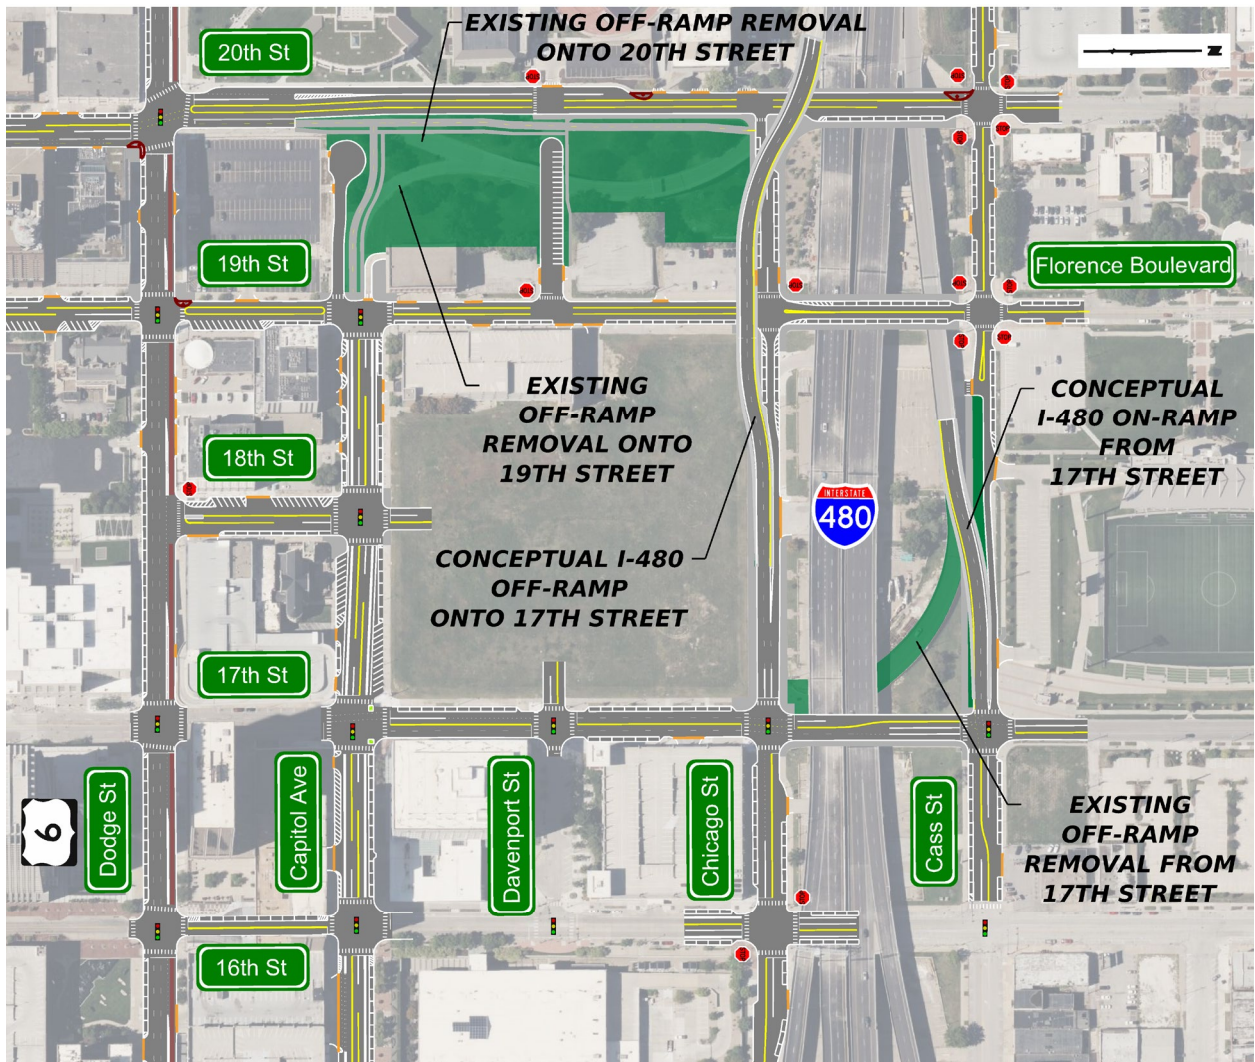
Conceptual 17th Street, 19th & 20th Street Ramp Reconfiguration (Scenario 3)
